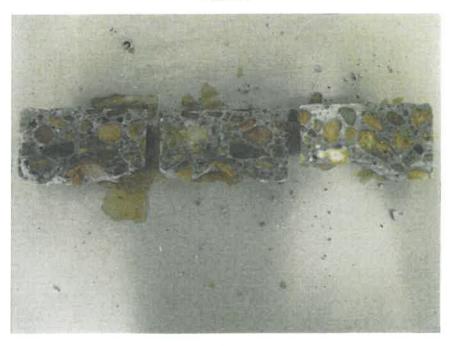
Longitudinally sawn sections of Core #5 from arch. No fractures are apparent.
